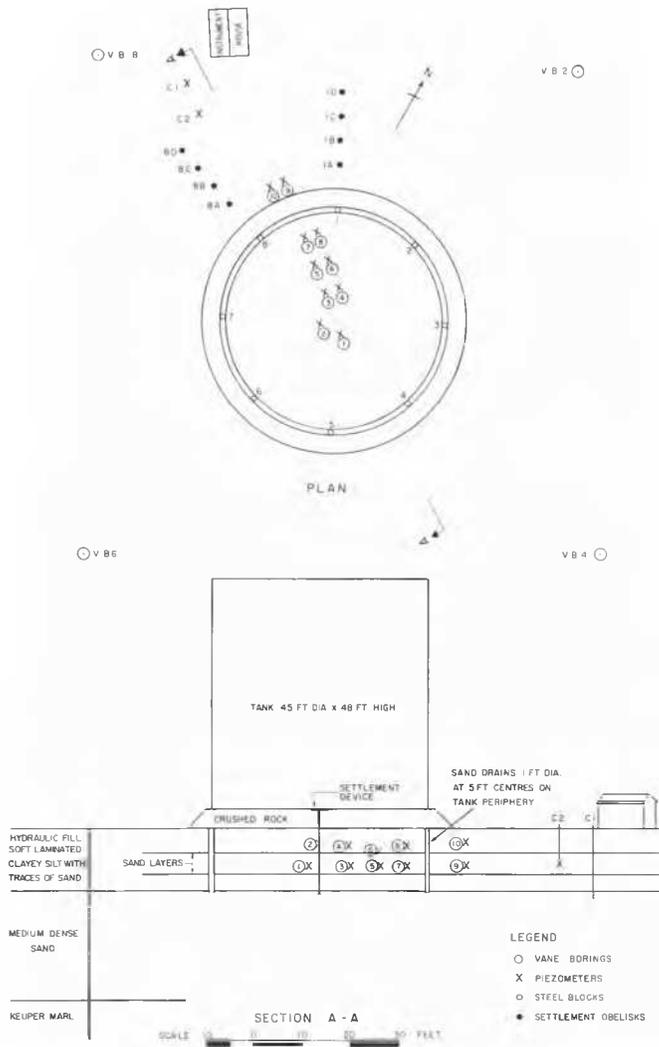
Plan and section through the tank showing the positions of the piezometers, vane borings, and settlement observation points.
